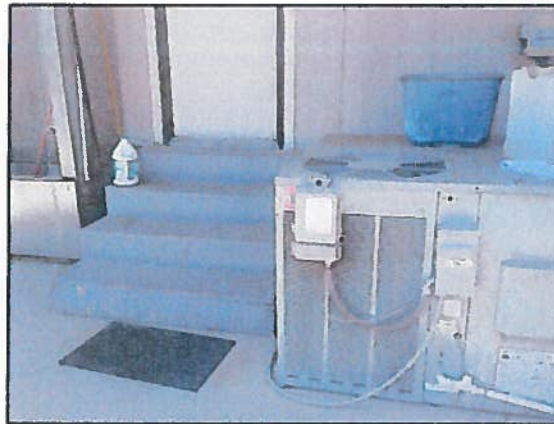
Fire Station 4 – Back door steps in need of repair and railing for safety
